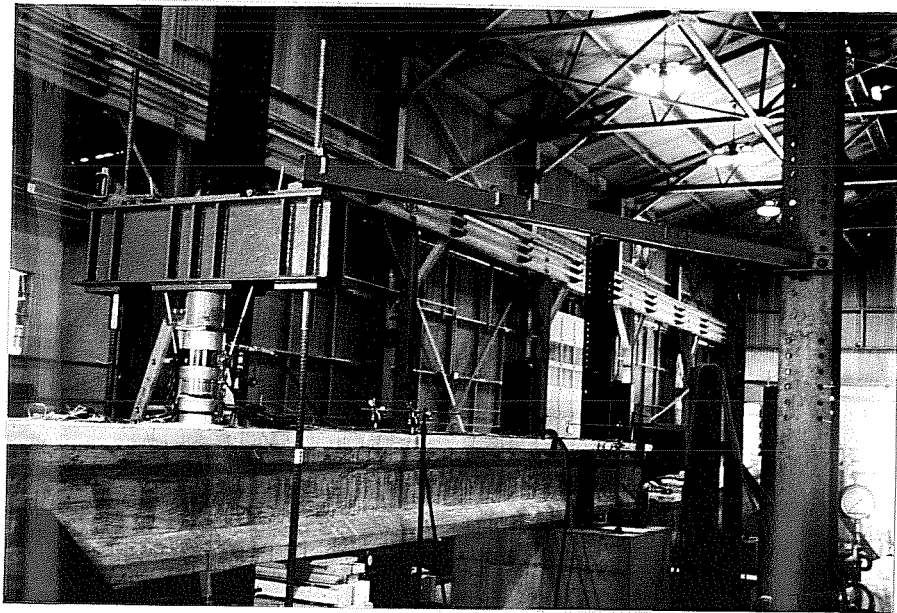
Test setup for Specimens 3-1 and 3-2.
